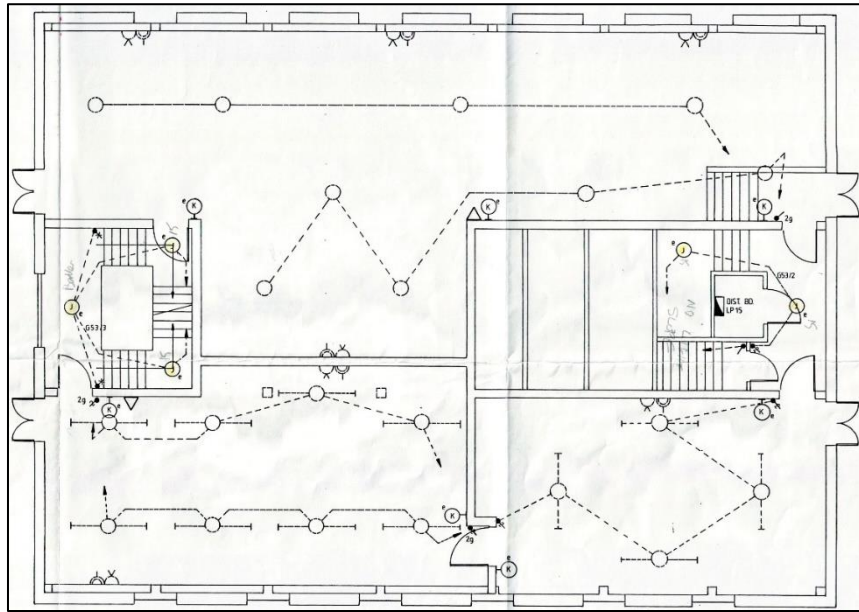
1994 plan of the fifteenth floor, not to scale (J.E.Greatorex & Partners)
